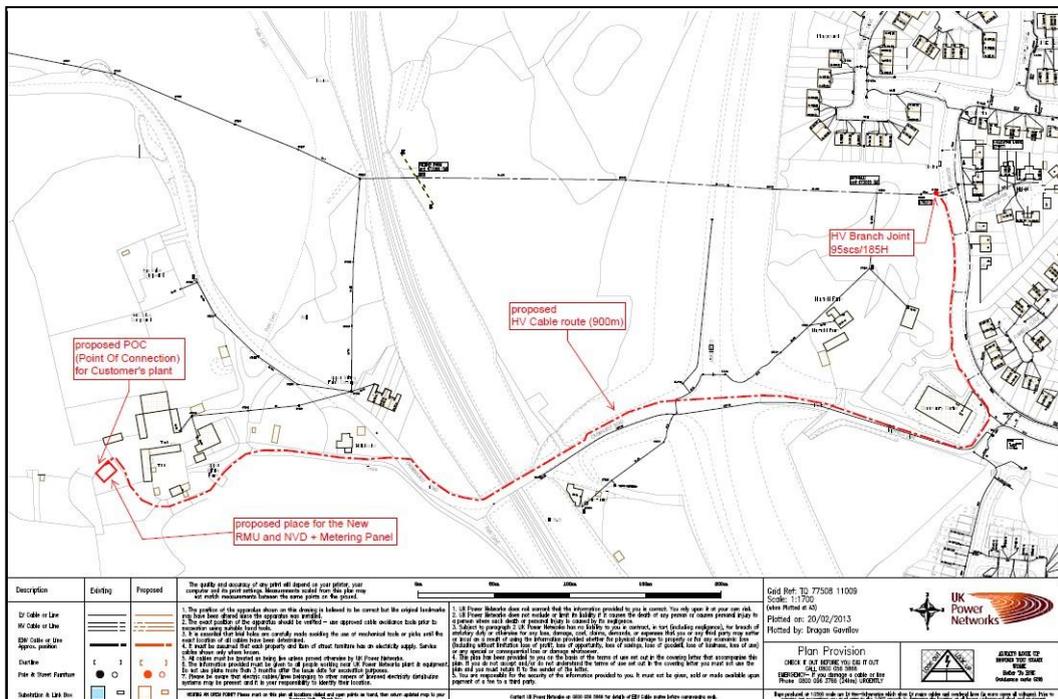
Cabling plan for connections up to 2.5MW (UK Power Networks)
